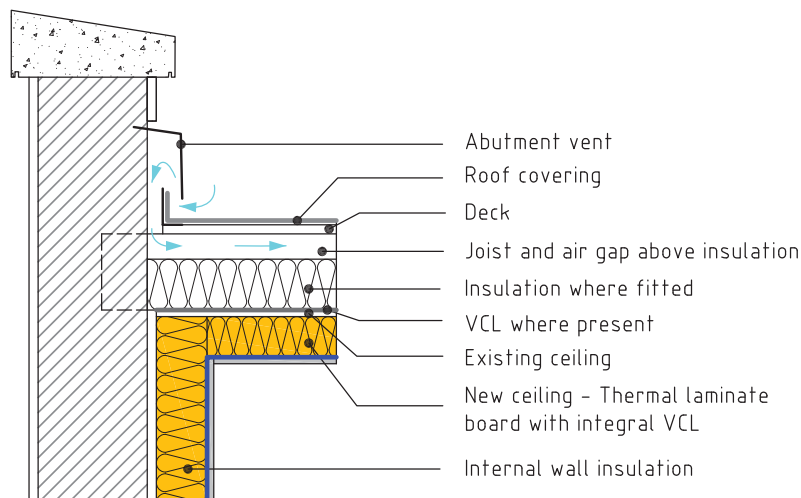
Cold roof with abutment upgraded with thermal laminate board, carried out with internal insulation
